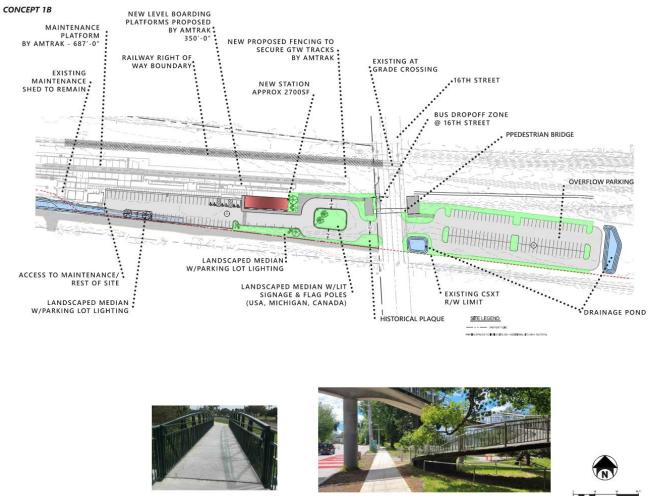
Option 1B Conceptual Plan w/ Pedestrian Bridge Crossing
